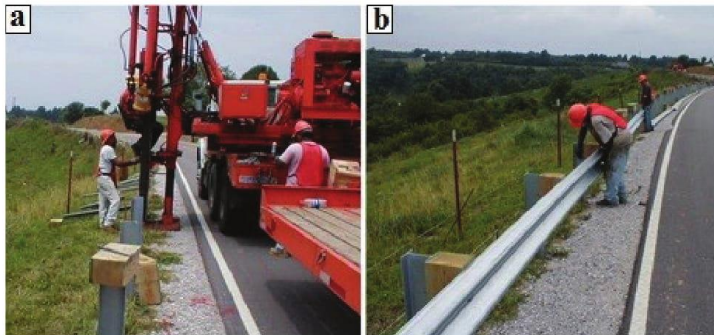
Steps in Installation: a. Post Driving; b. Guardrail Mounting
